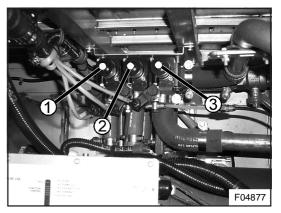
Hot water valves in combustion heater compartment (in front of left drive wheel)
